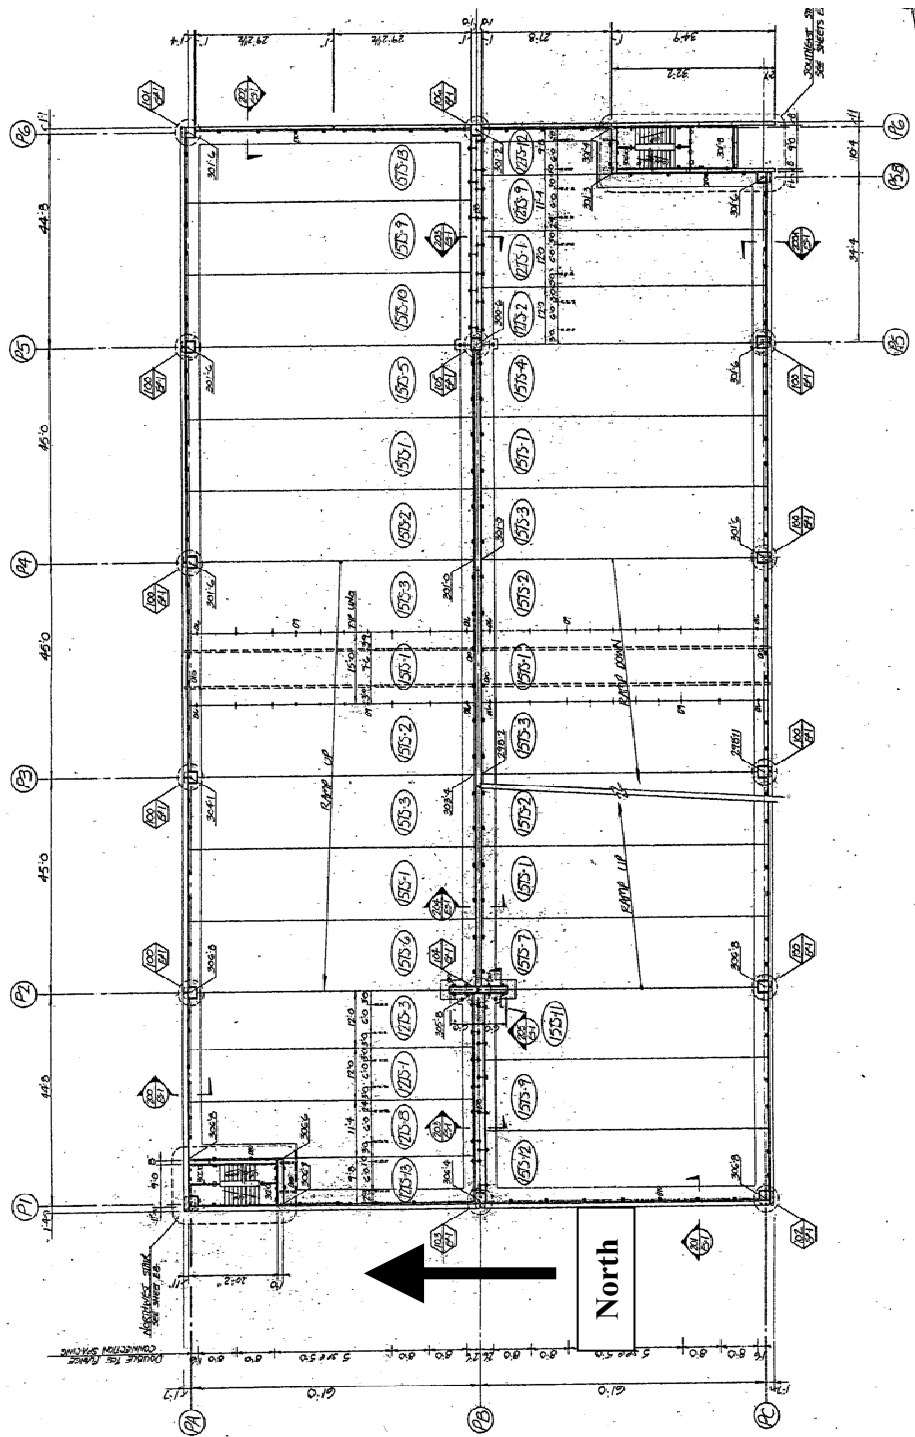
As-built drawing of a typical floor of the Lehigh University Campus Square Parking Garage.
